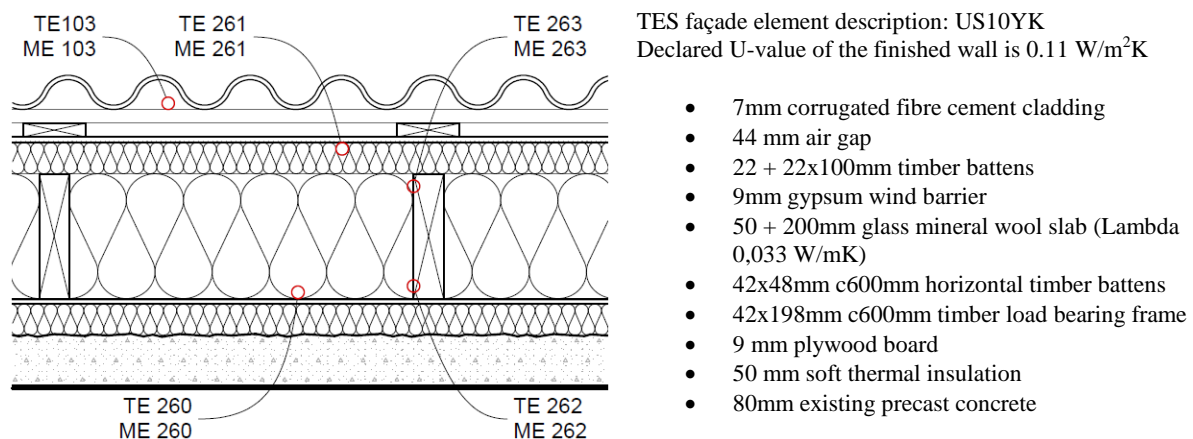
Monitoring positions of the presented Oulu TES Façade element.
